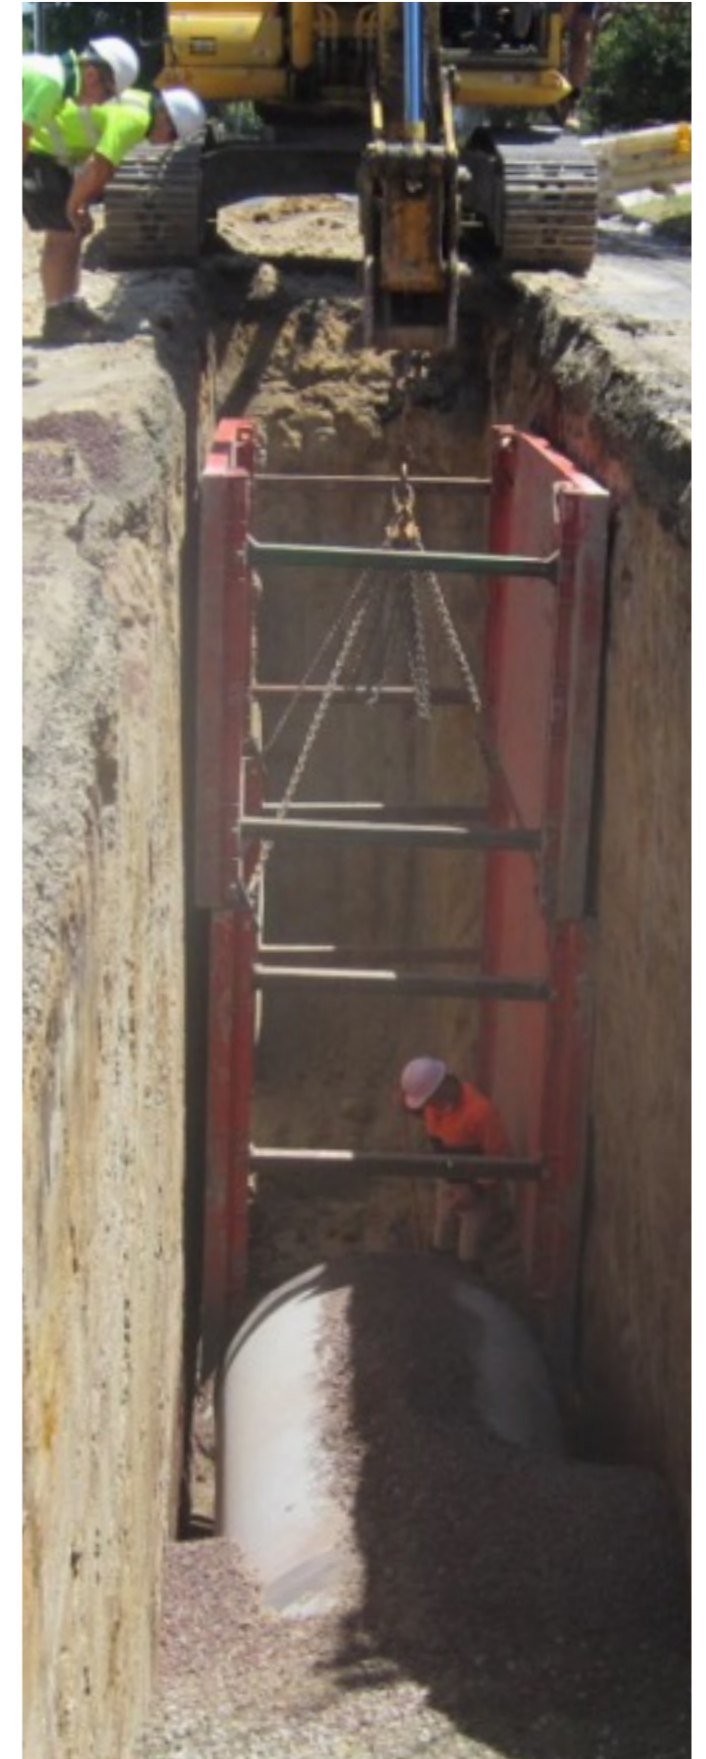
Constructing a large stormwater pipe upgrade in Clarinda, 2021.
